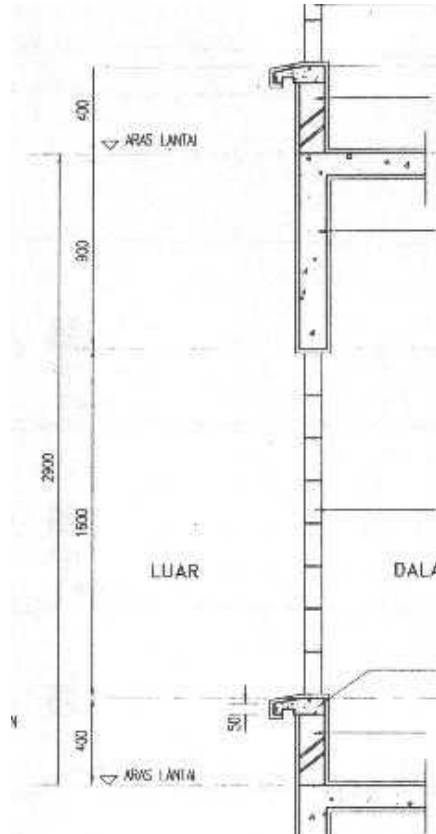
Critical Structural Details (e.g. wall section, foundations, roof-wall connections, etc.)
